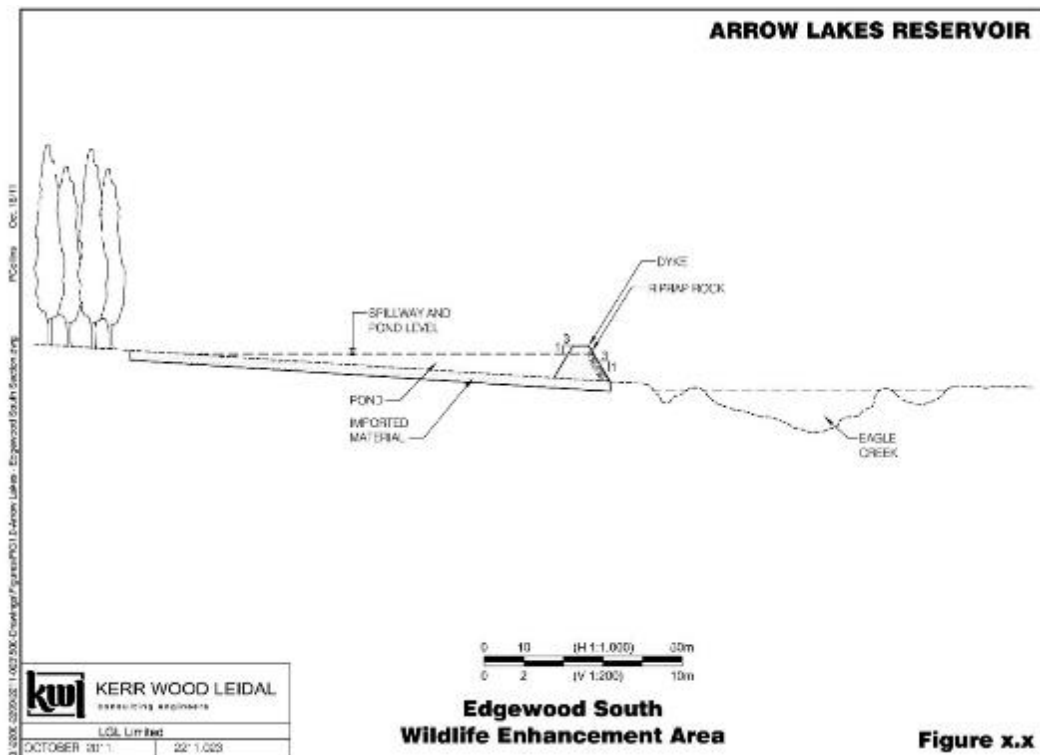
Cross-section of the proposed wildlife physical works project at Edgewood South
